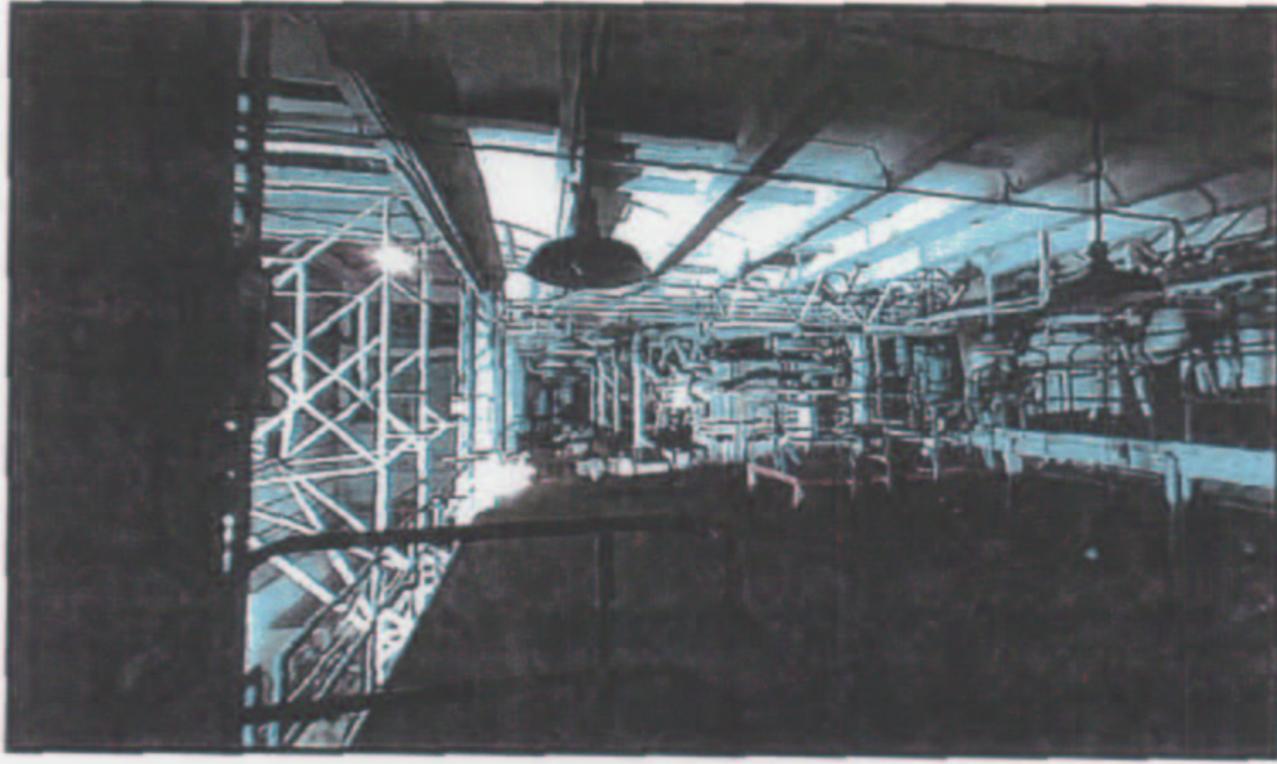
Elevator Access/Ventilation Area located on the 3rd Floor of Building C-420.
